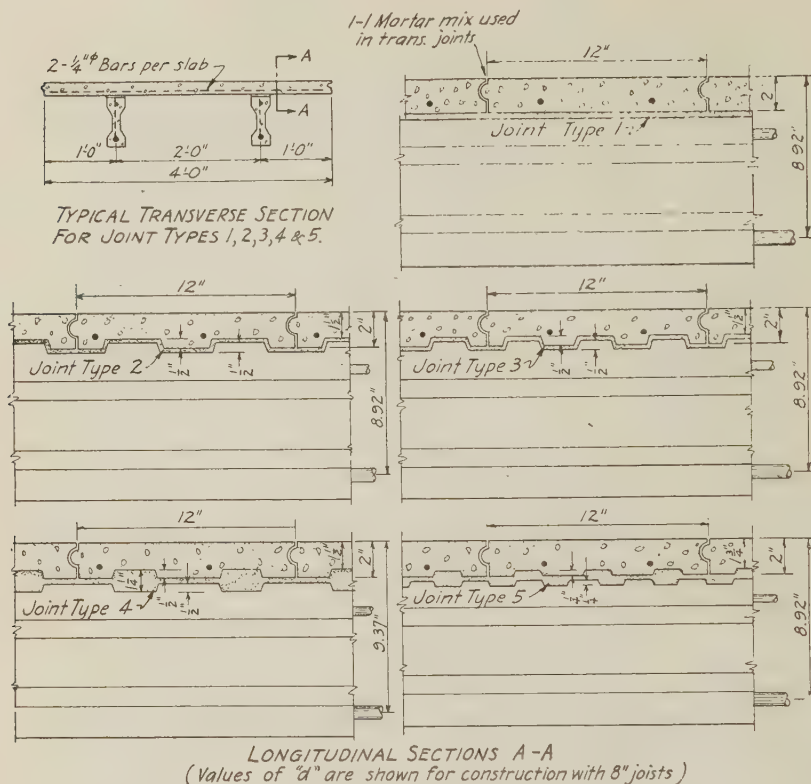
DETAILS OF BOND JOINTS USED WITH 4 FT. BY 1 FT. BY 2 IN. PRECAST FLOOR SLABS
